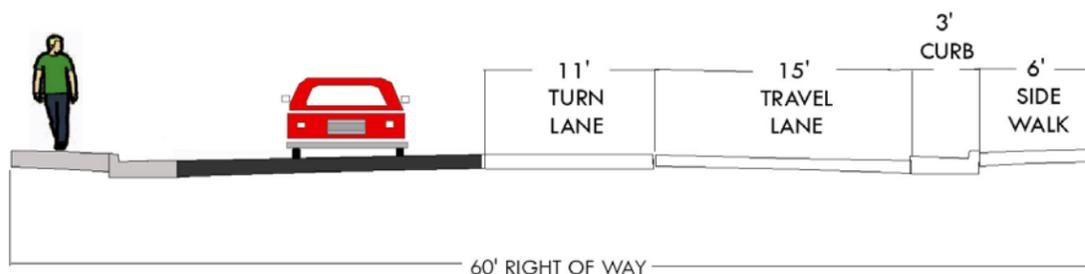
Example of typical 60 foot street cross section with sidewalks but no buffer
